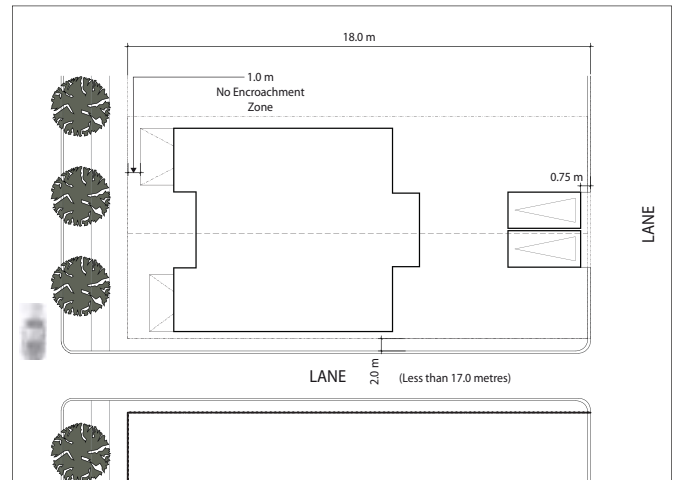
The minimum exterior side yard setback is 2.0 metres when the yard abuts a public right-of-way less than 17.0 metres.
